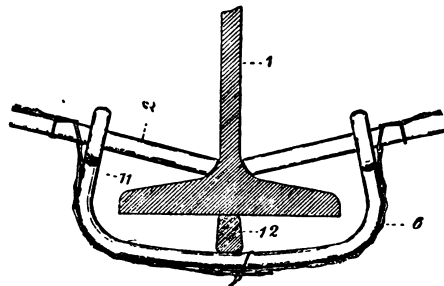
Enlarged Section of Beam of Fig. 5.
